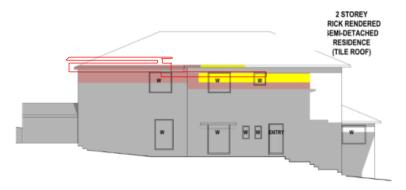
Proposed shadow impact to No. 59 Reina Street at 12noon on 21 June (additional shadowing outlined in red, sunlight shown in yellow)
